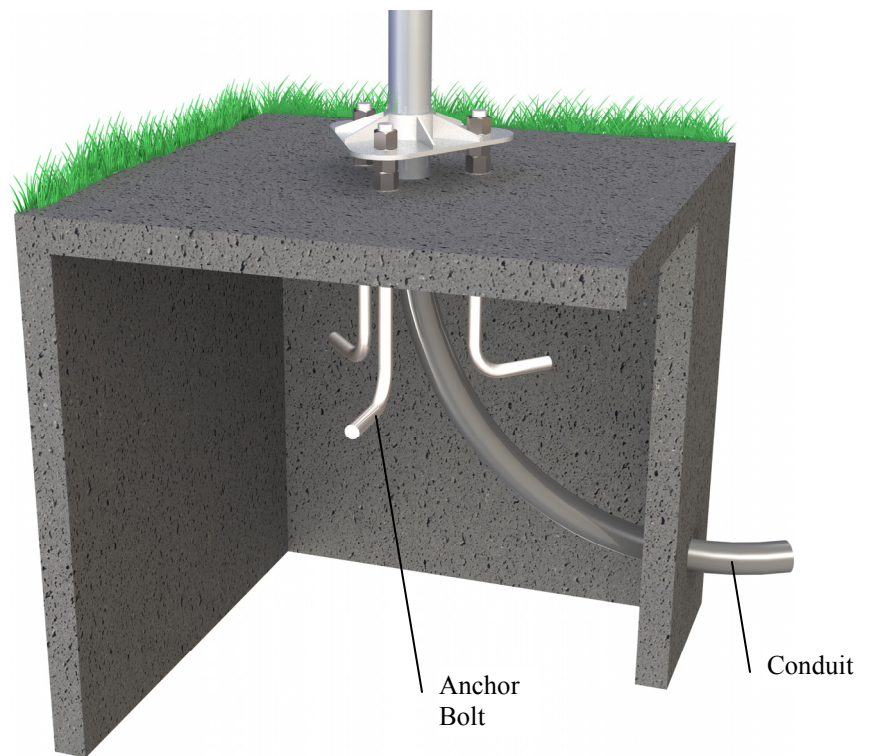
Cut-Away View Shows Anchor Bolt and Conduit Placement in Cement Pad
